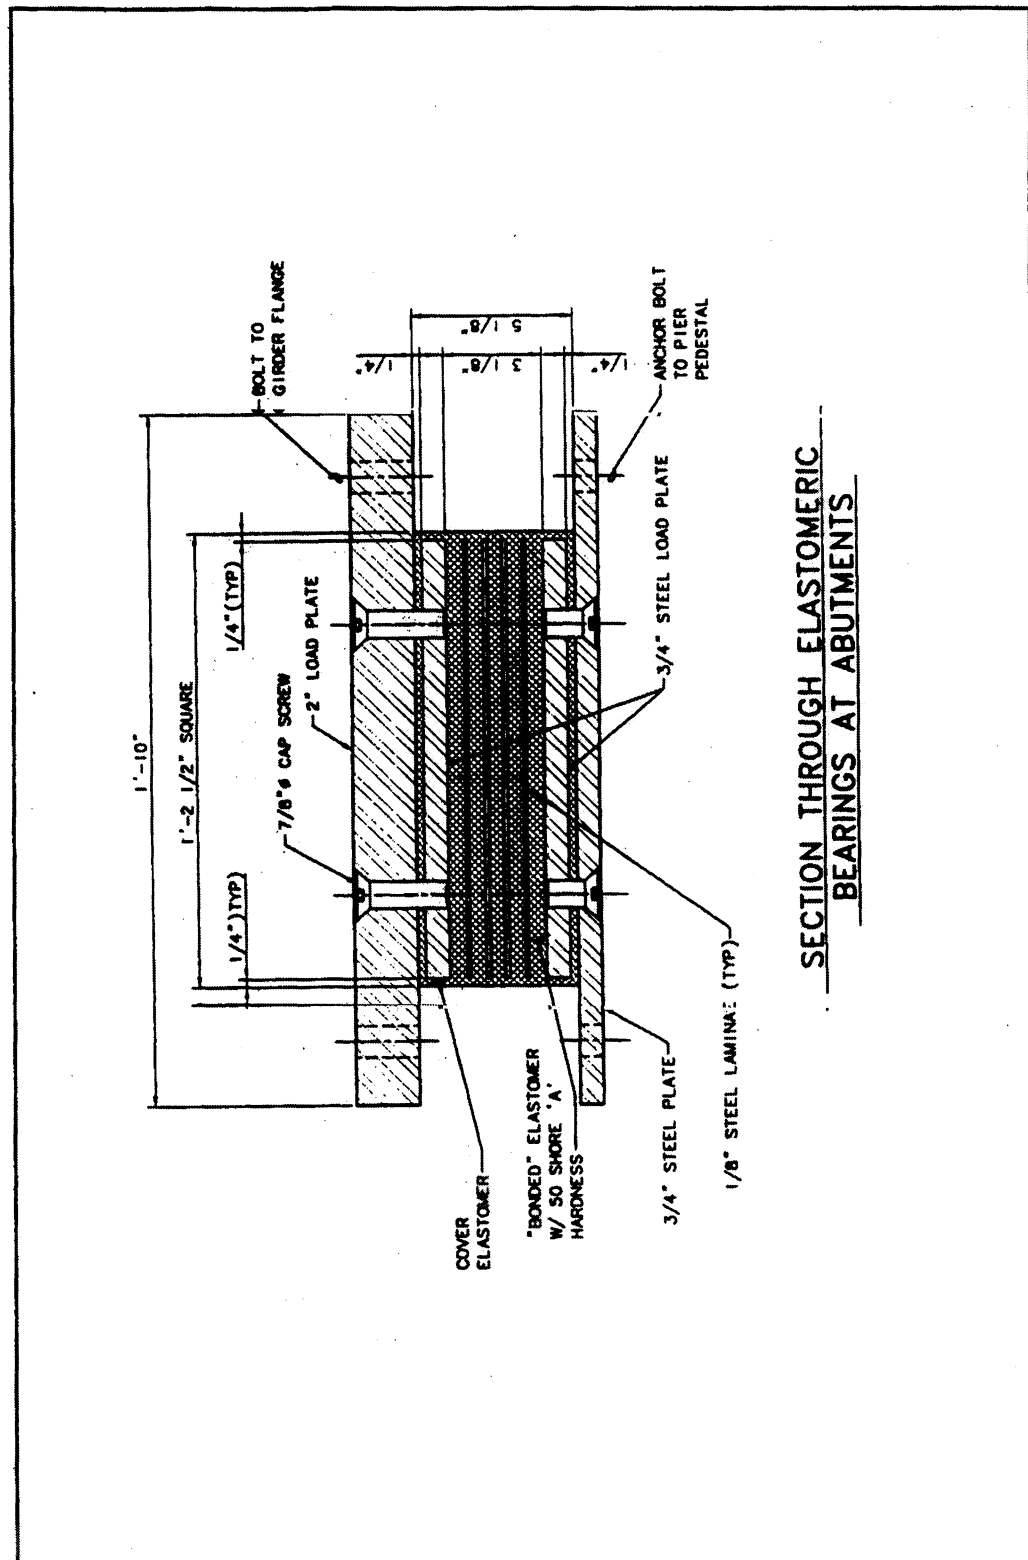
Bridge No. 2 – Elastomeric Bearings at Abutments
